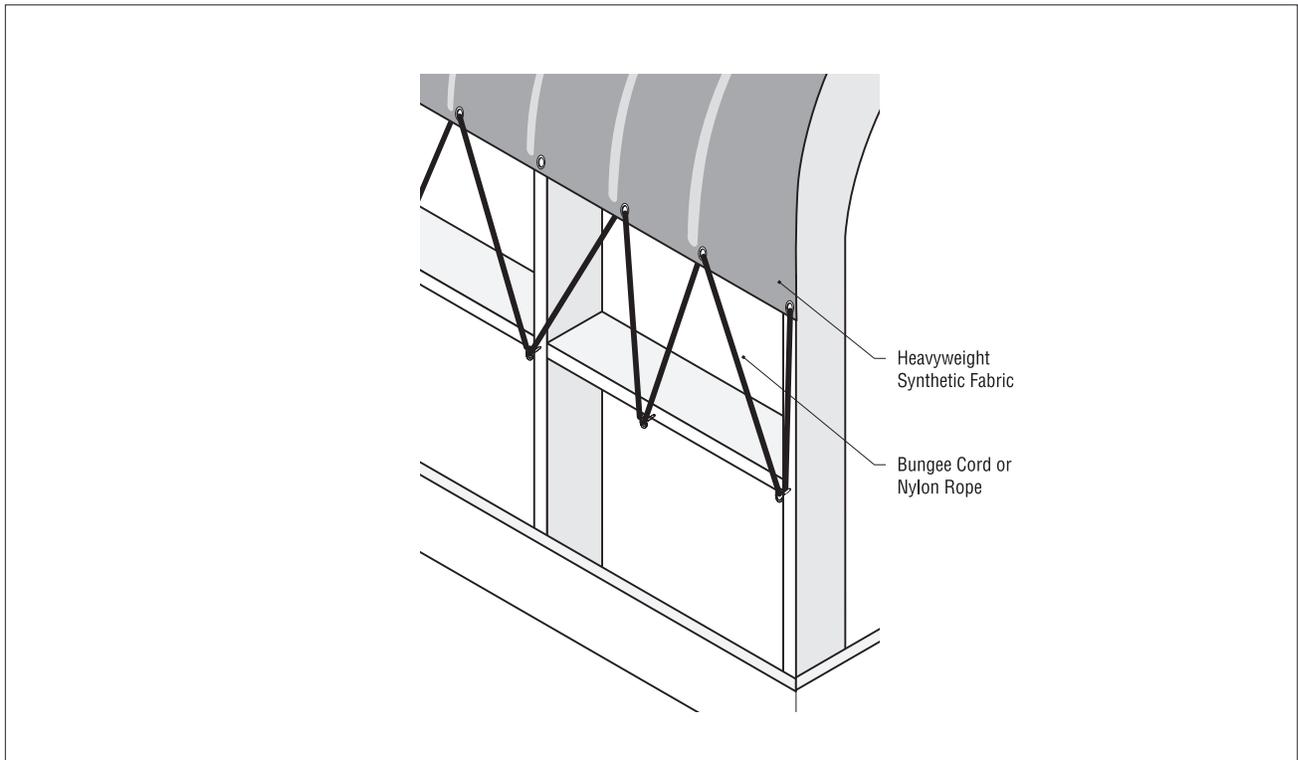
Common method of anchoring heavyweight synthetic fabrics.
